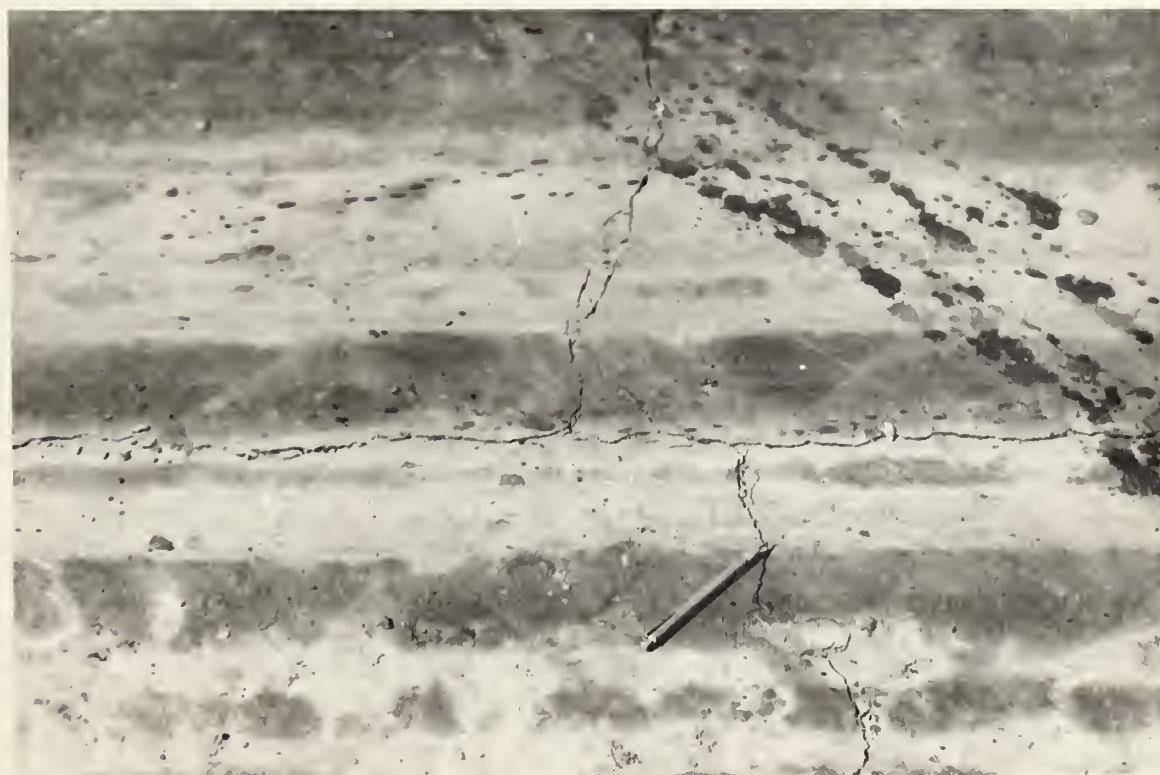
and 8 show typical cracks as they occur in the soil-cement base courses. Photograph 7 is a single transverse crack. Photograph 8 shows a transverse crack extending across two lanes and a longitudinal crack along the construction joint between lanes.
